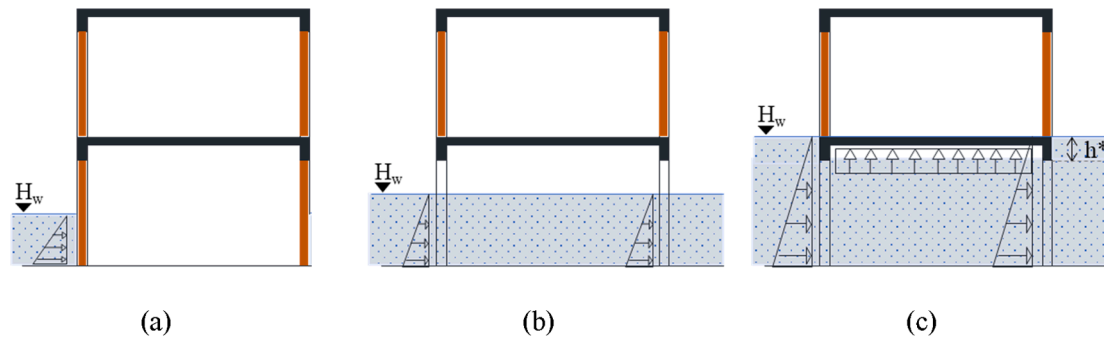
Tsunami-induced loads for increasing tsunami inundation depth,  $H_w$ : (a) before the collapse of ground storey masonry infill walls, (b) after the collapse of ground storey masonry infill walls and (c) when the water depth reaches the soffit of the first storey beams, inducing internal buoyancy.
